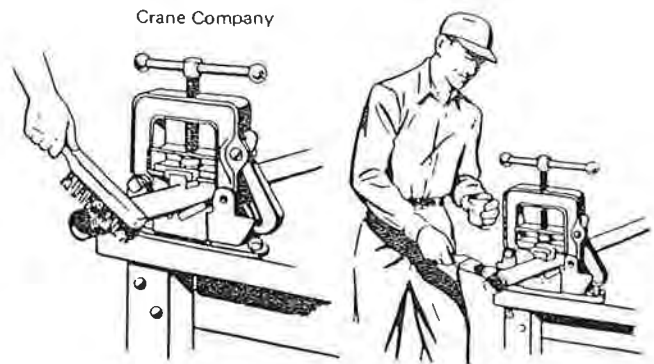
Cleaning and doping newly cut pipe threads.
